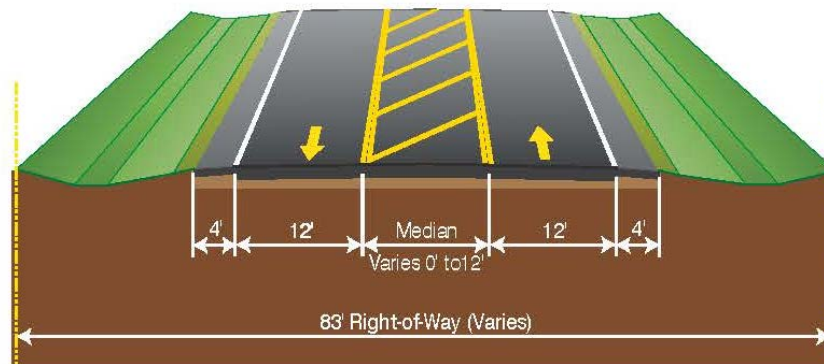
3 Existing Typical Section from Enterprise Ave to Enchanted Lakes
